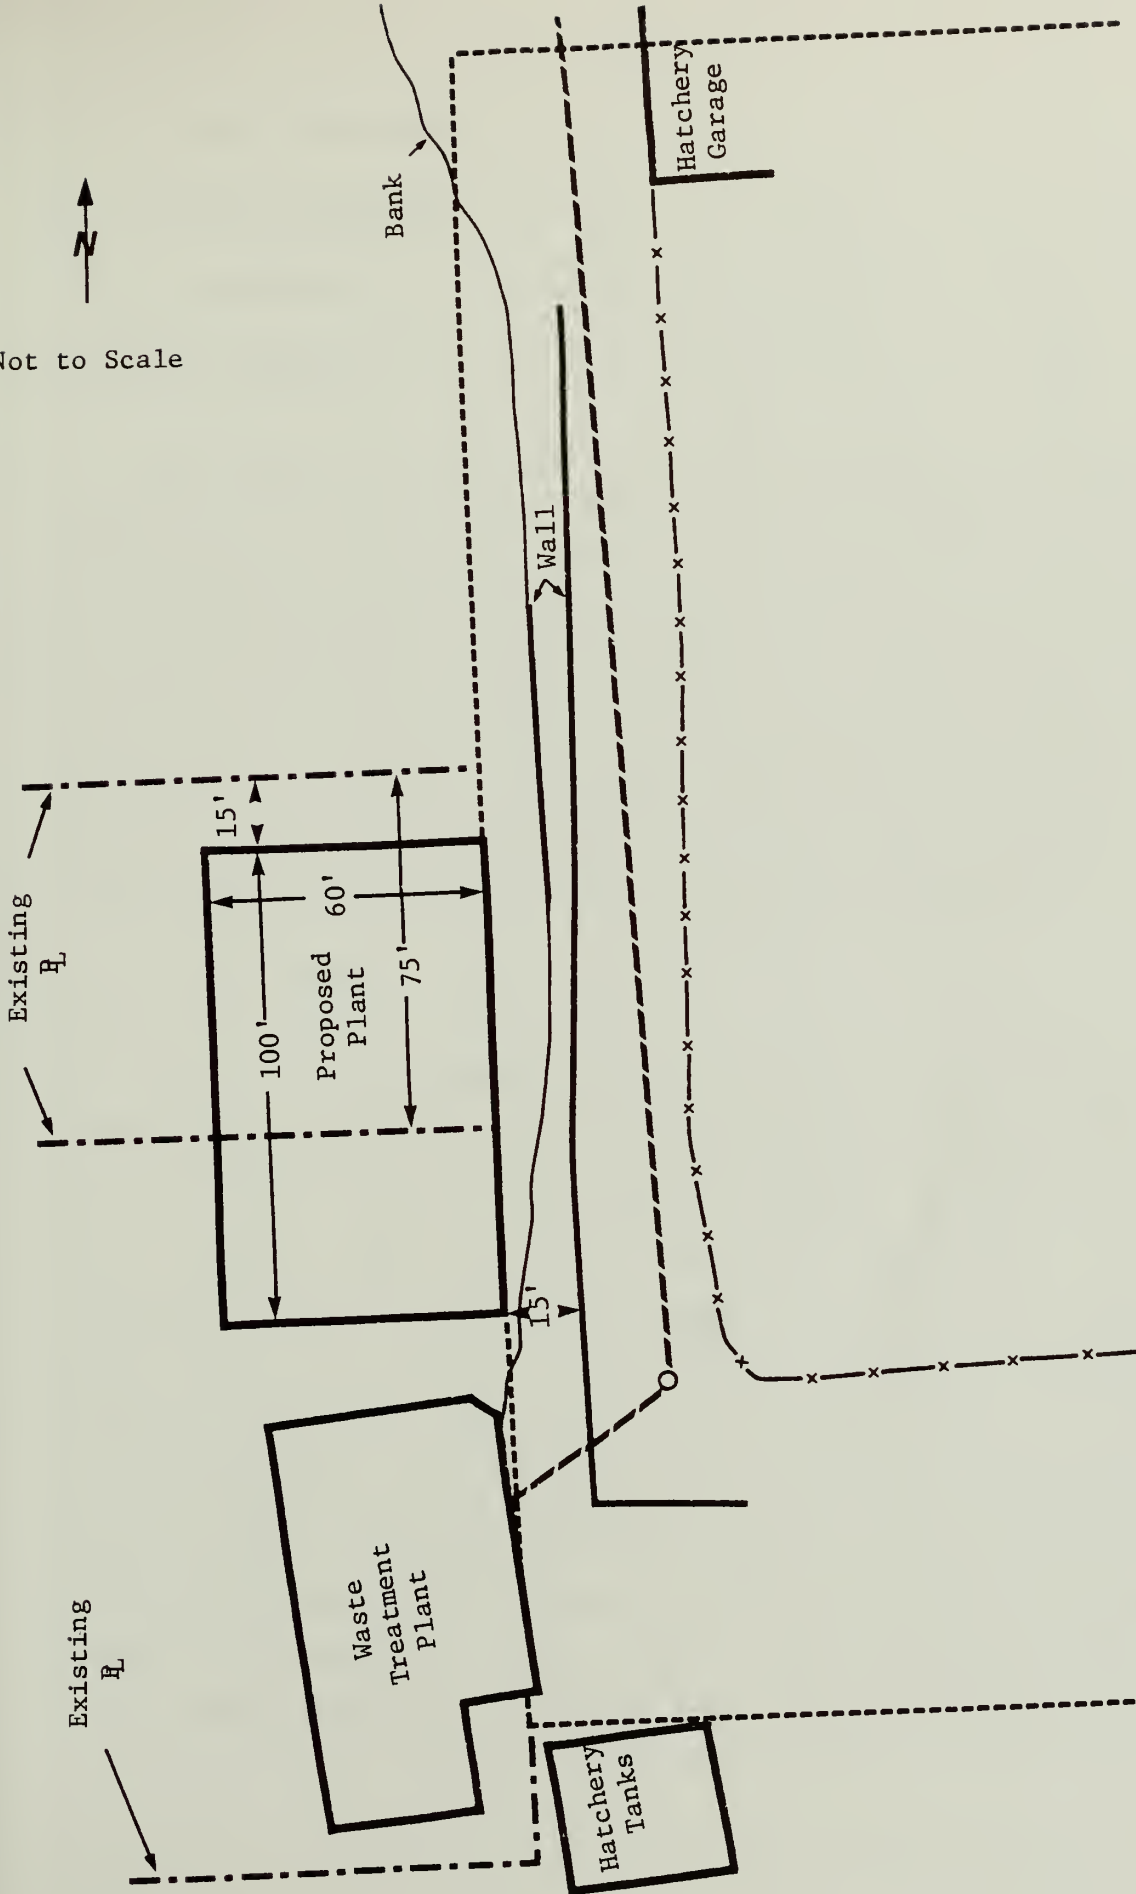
Site plan for Alternative 1, St. Croix Falls, Wisconsin.
